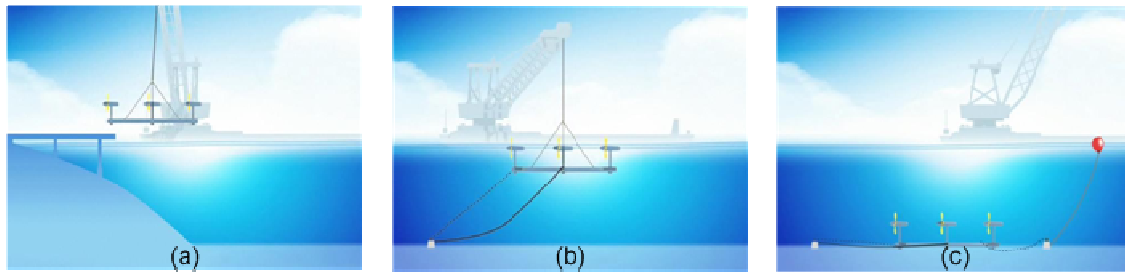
(a) Assembly is loaded onboard; (b) Assembly is lowered on the seabed using a crane; (c) device marked for future recovery (Courtesy Tidal Energy Ltd)
